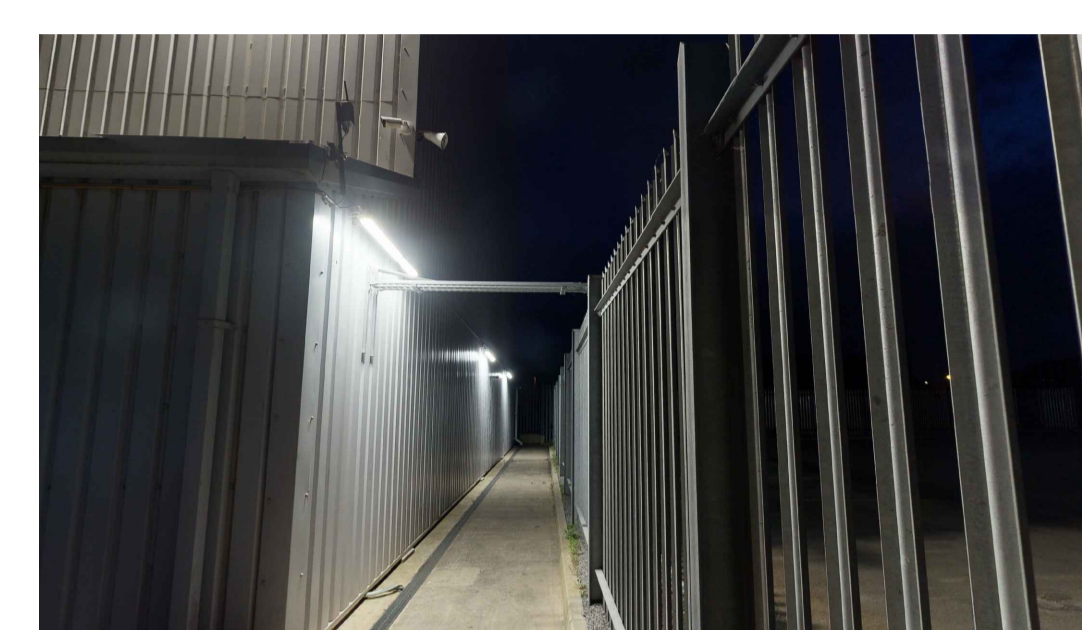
showing batten luminaires along north west face of Wood Burning Building
